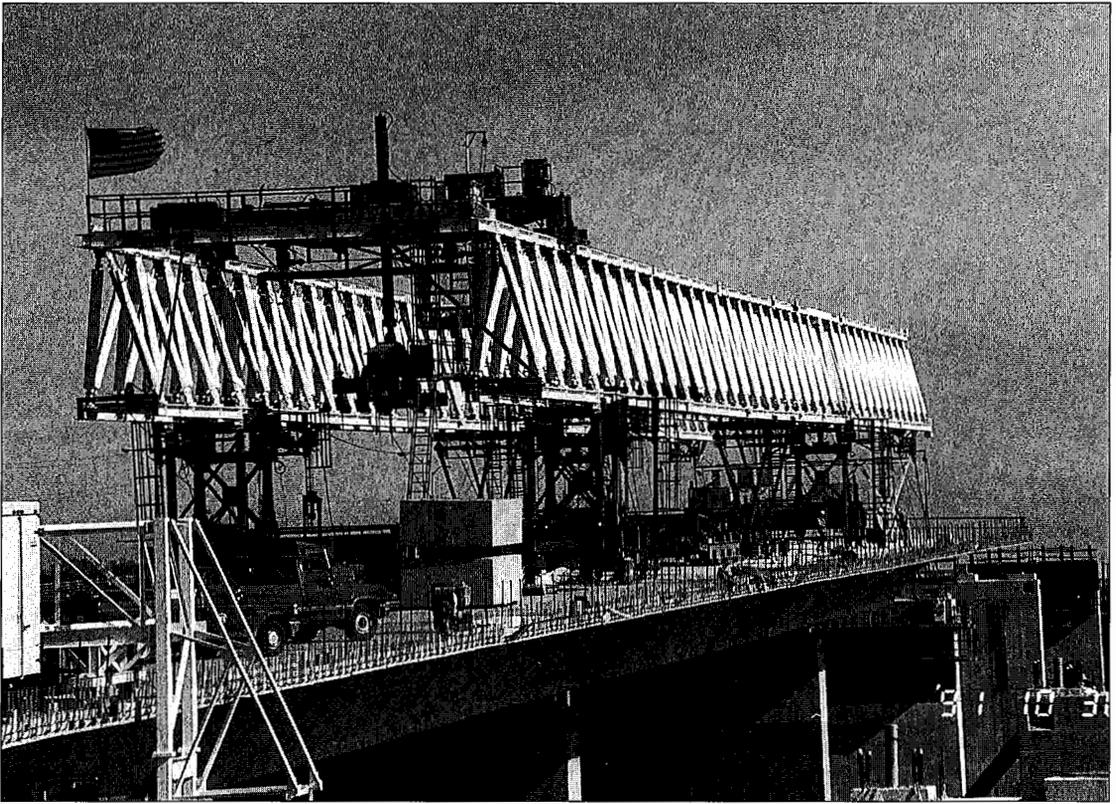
A view of the new Baldwin Bridge launching gantry.
